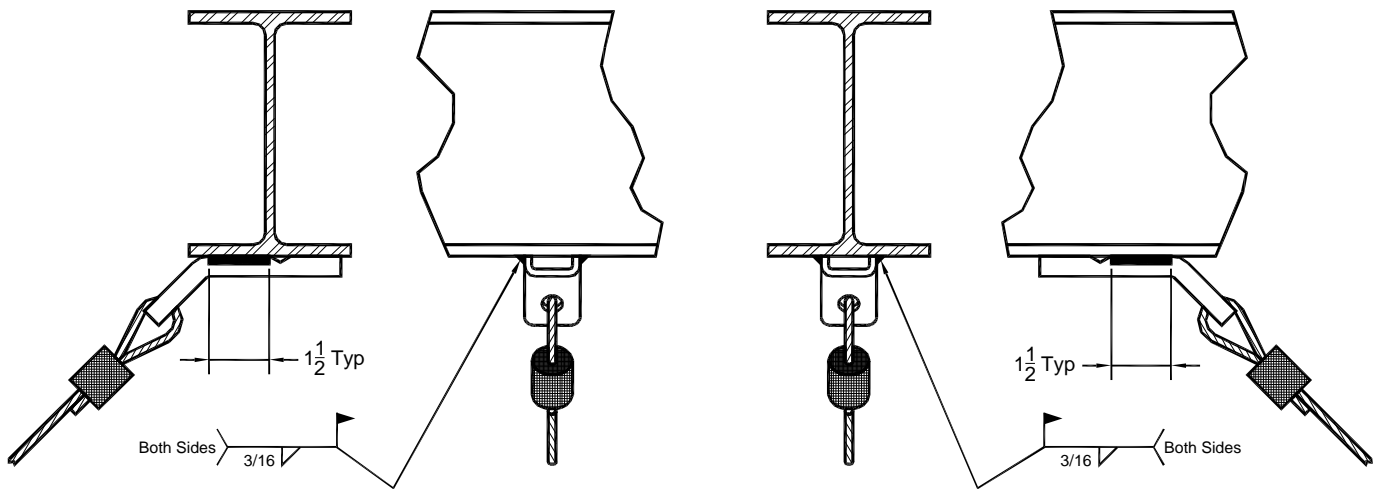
; KSCA Bracket Welded to Structural Steel in Orientation 1
